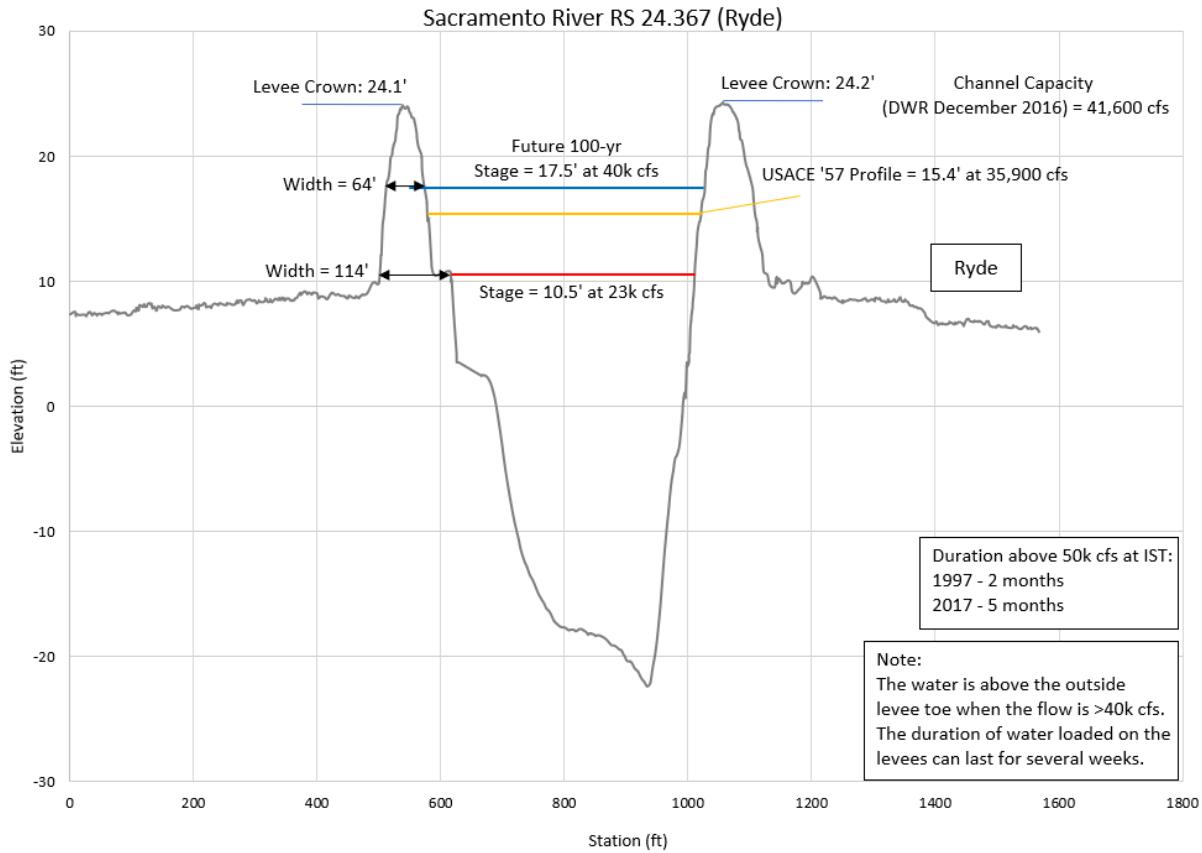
Cross Section at Sacramento River Station 24.367 at Ryde Viewing Downstream
